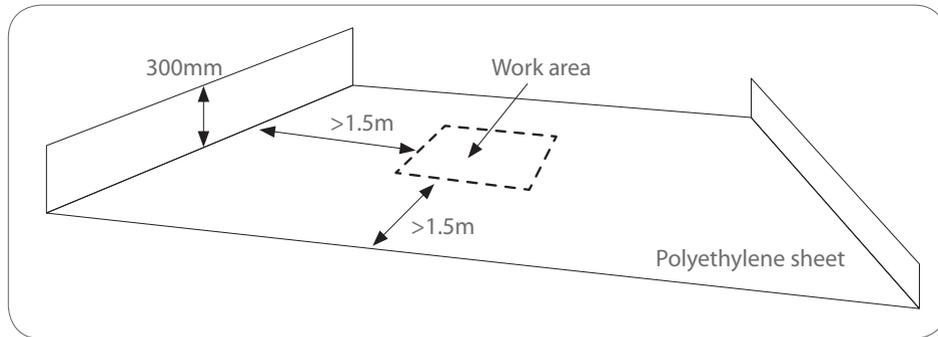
Flooring to be covered with polyethylene sheets at the asbestos work area.
